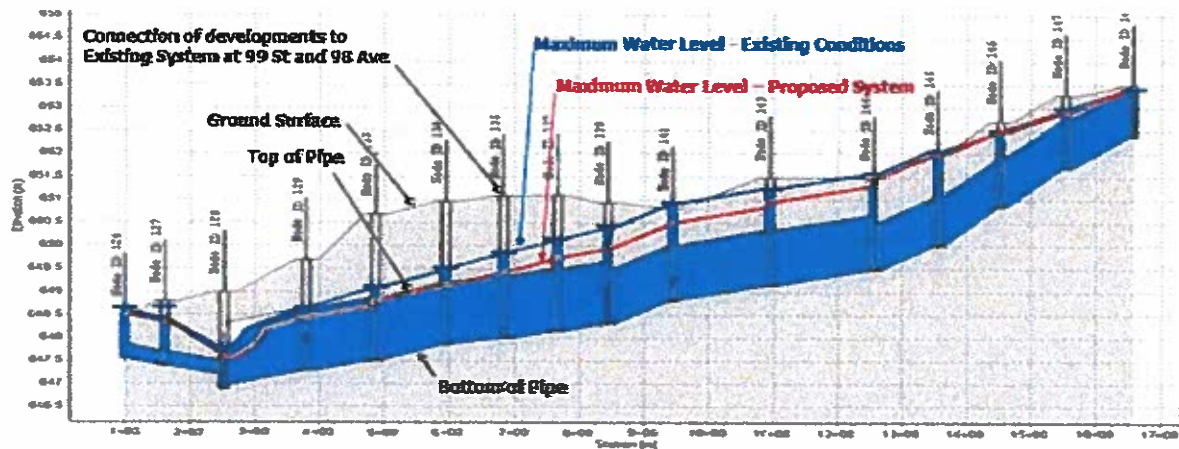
PROPOSED STORMWATER MANAGEMENT SYSTEM
